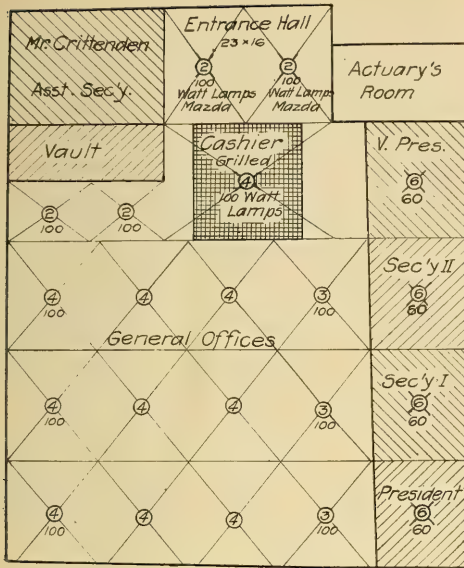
FLOOR PLAN OF OFFICES—BAY 14' X 16'.
